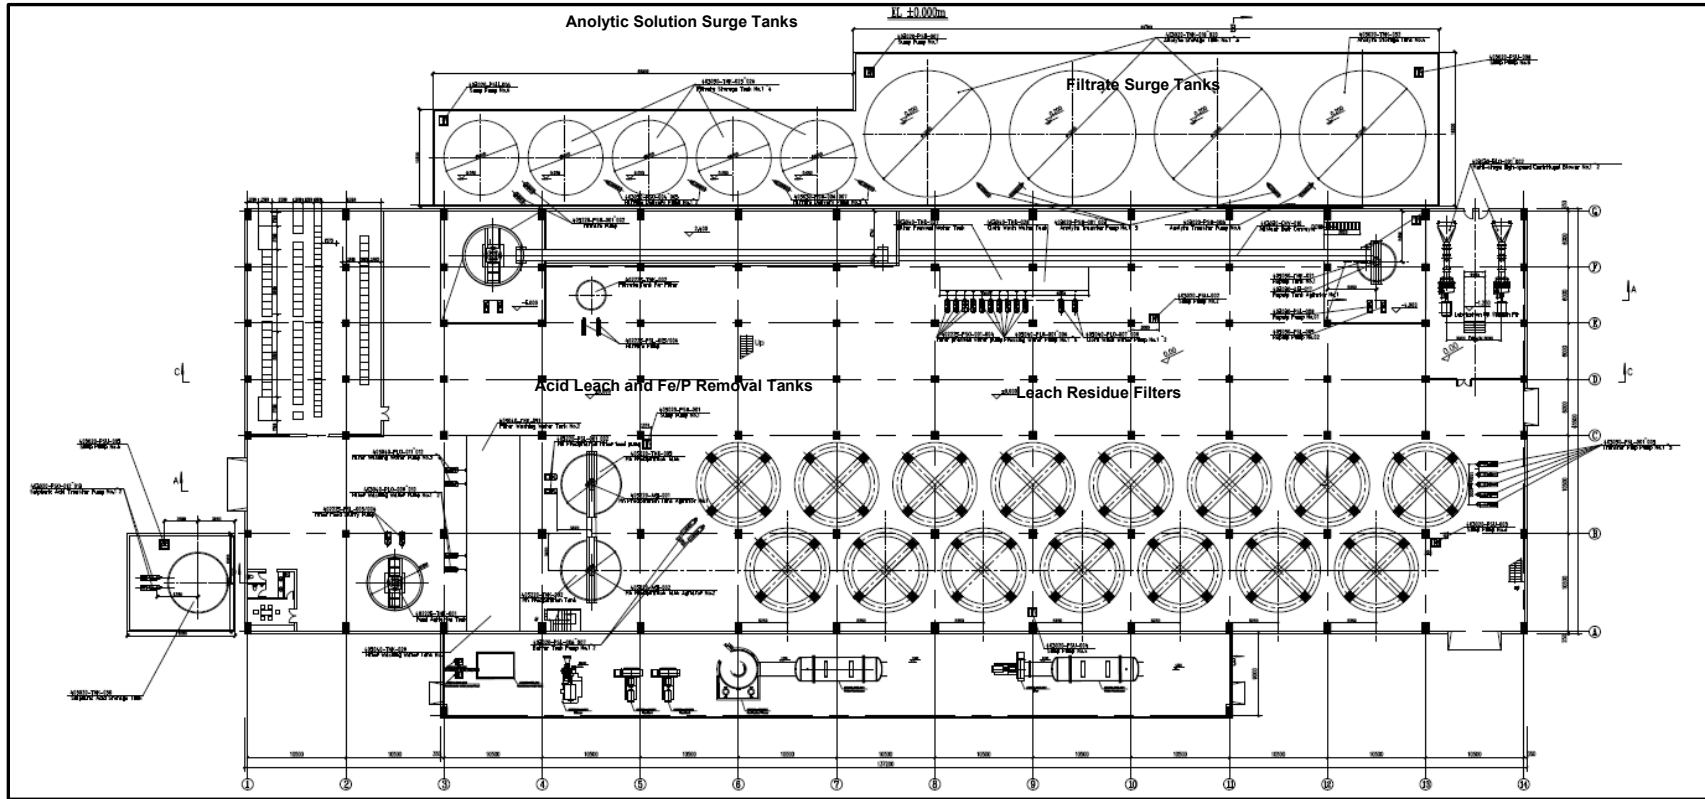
General Layout - Leach Residue Washing/Dewatering Facility
